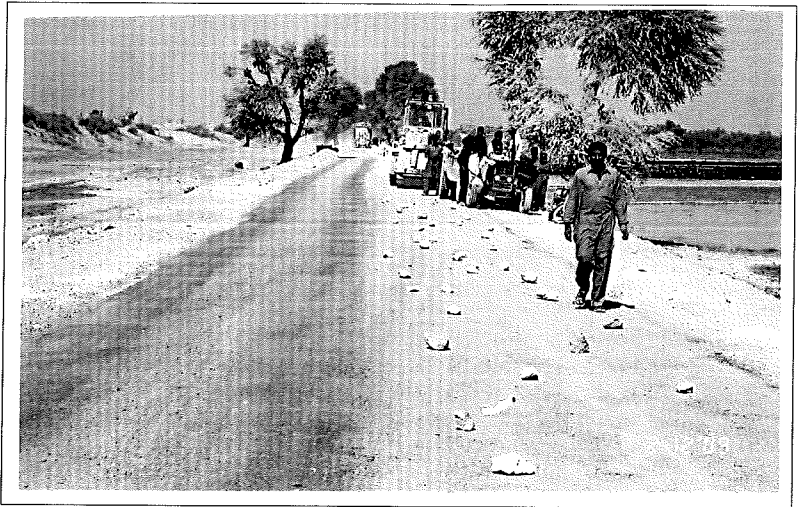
A 'good' section of the old road (26 km) improved with DST.
